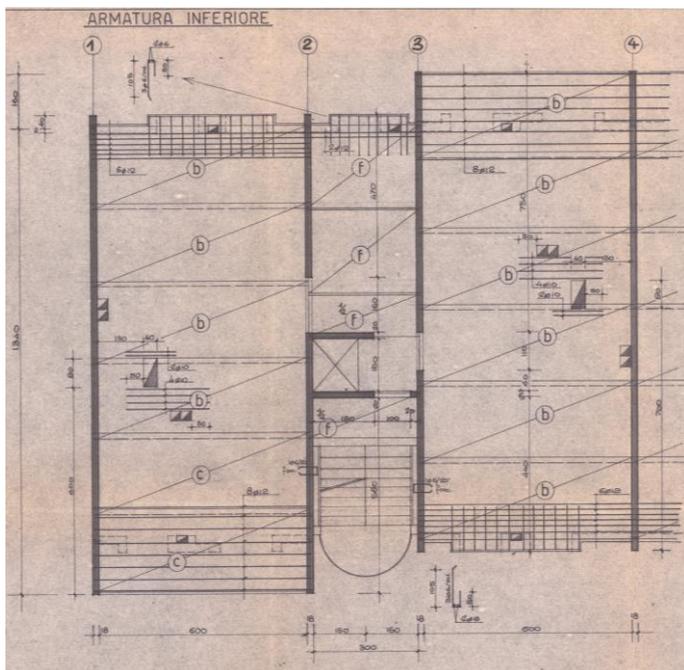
Coffrage-tunnel process. PEEP E 14 quarter, via Reiss Romoli. Structural drawing of reinforced concrete works / Procedimento *coffrage-tunnel*. Quartiere PEEP E 14, via Reiss Romoli. Progetto esecutivo delle strutture in cemento armato (ALSBC, Fondo Co-Ar, CEDV).
